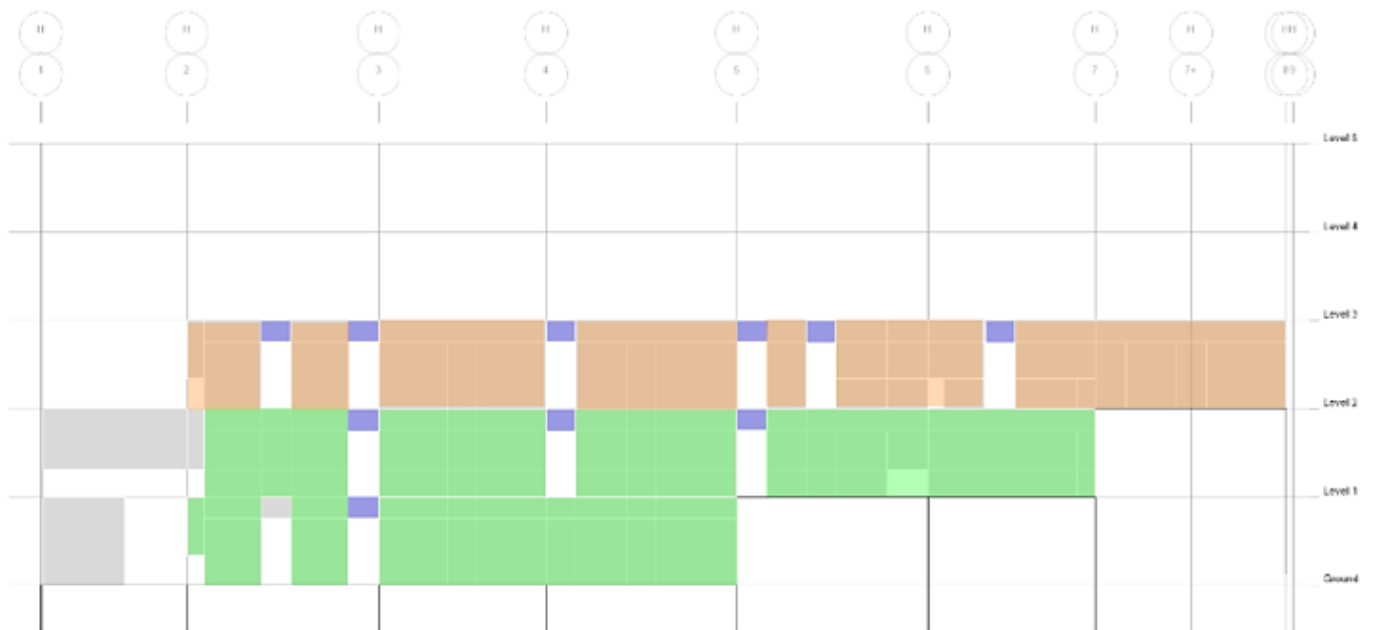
, Gridline H Longitudinal Direction Wall – North Structure
